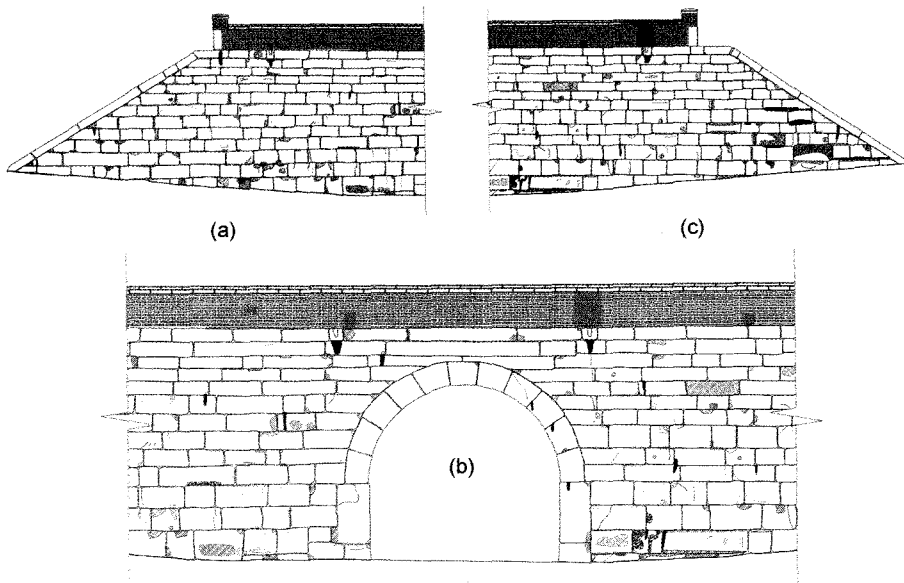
a; west, b; central, and c; east sides of the north wall.
